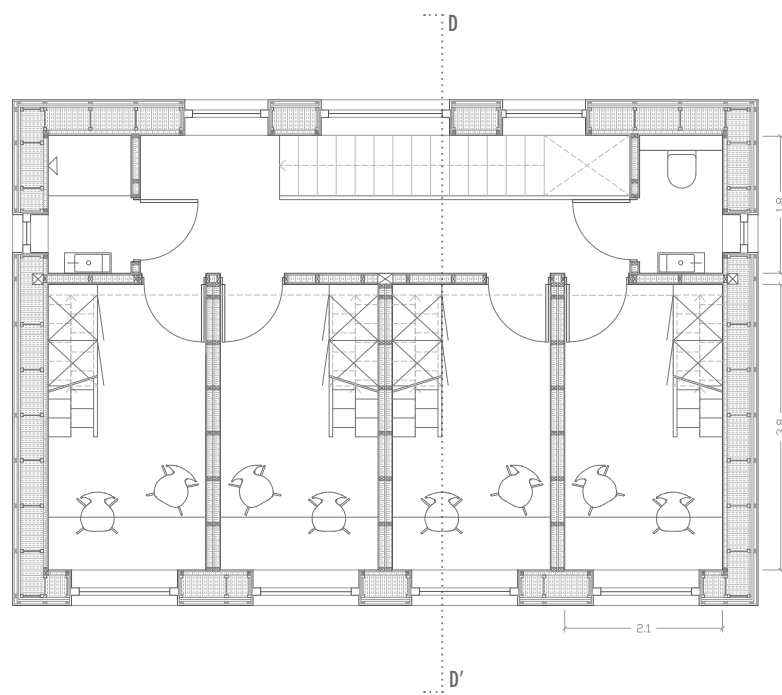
PLAN AND SECTION OF DIFFERENT STAIR CONFIGURATIONS, SCALE 1:100
